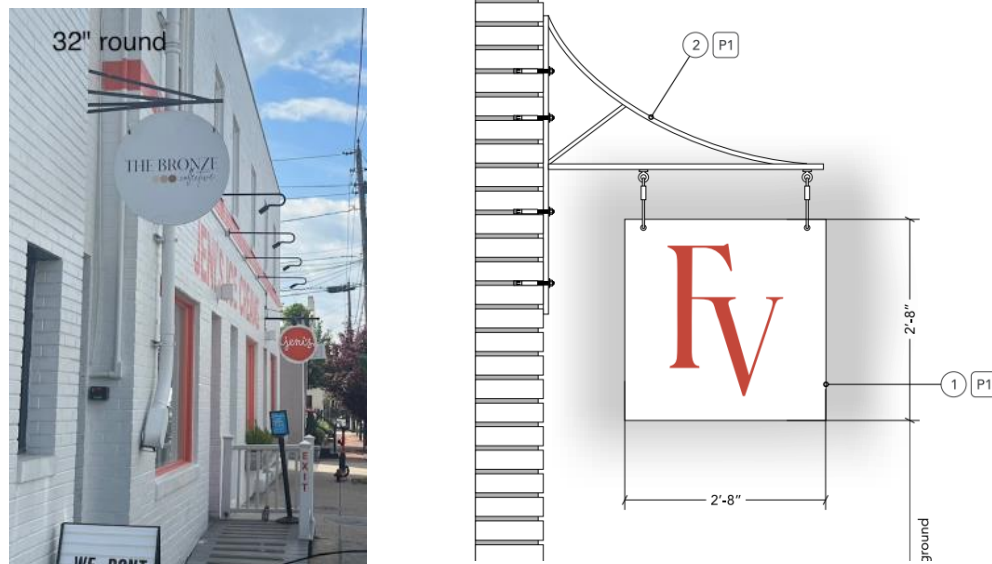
Existing South Patrick Street façade with proposed blade sign location and design
